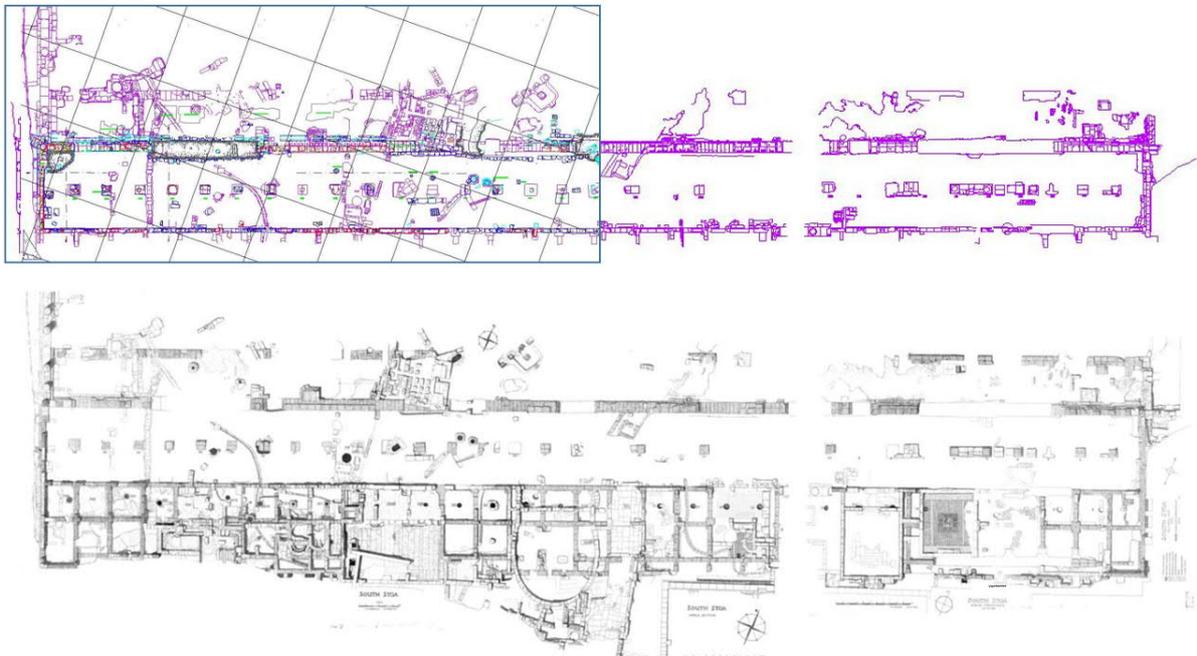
The united plan of Broneer's designs with geolocation and the new plan with the track of changes
